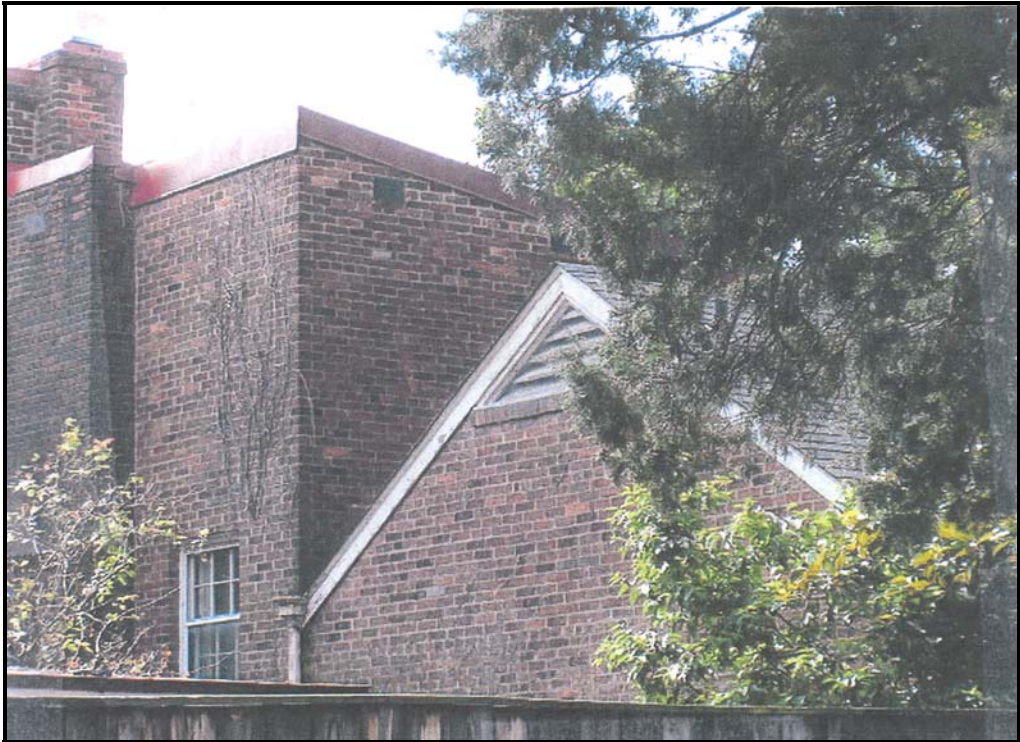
Existing North Elevation Showing Rear Ell and One Story Addition
